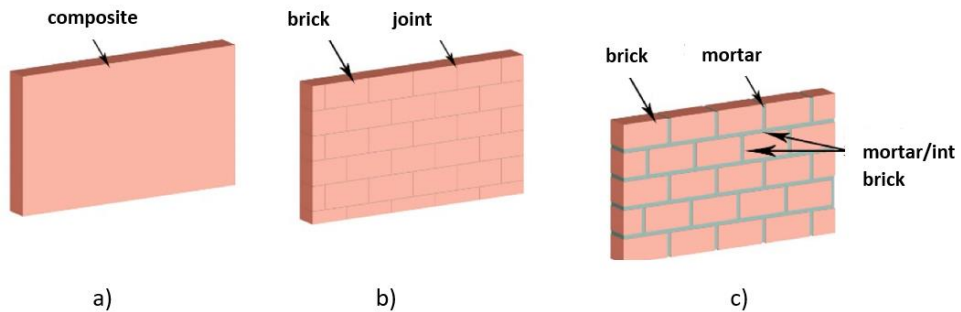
Modelling techniques of masonry (a) Macro modelling, (b) simplified micro modelling, (c) micro modelling [20].
